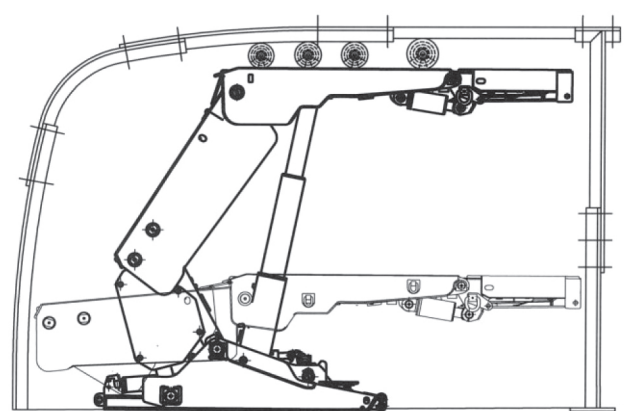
ŁPro/A frame with an installed powered support unit (unit before and after spragging)
